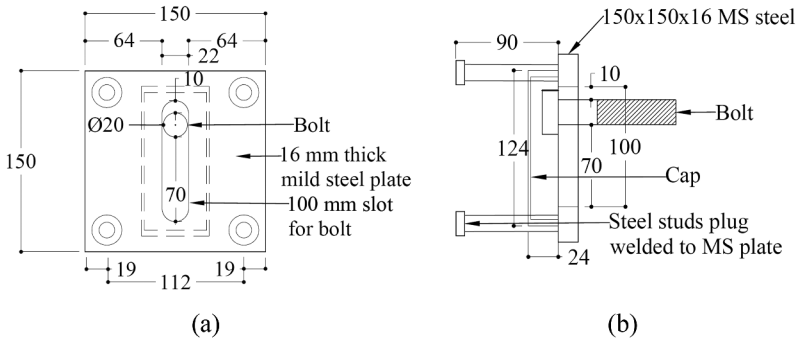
Steel-embed details (dimensions in mm): (a) front view; (b) side view.
